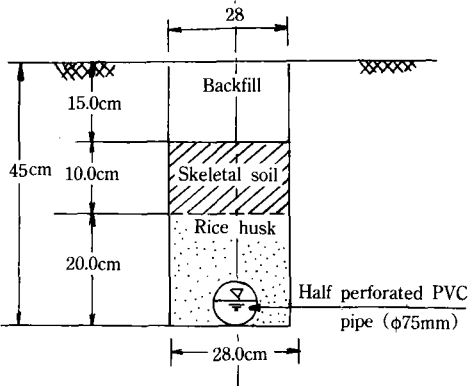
Rice husk surrounds for half perforated PVC pipe drainage
